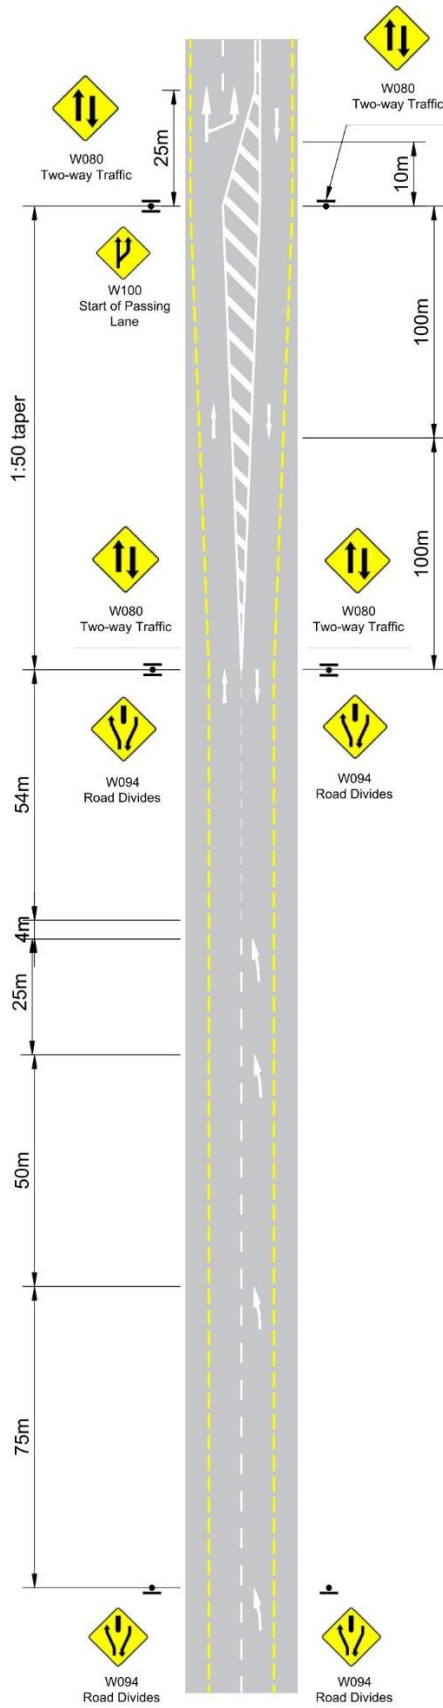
Change between Standard Single and Type 3 Divided Road
